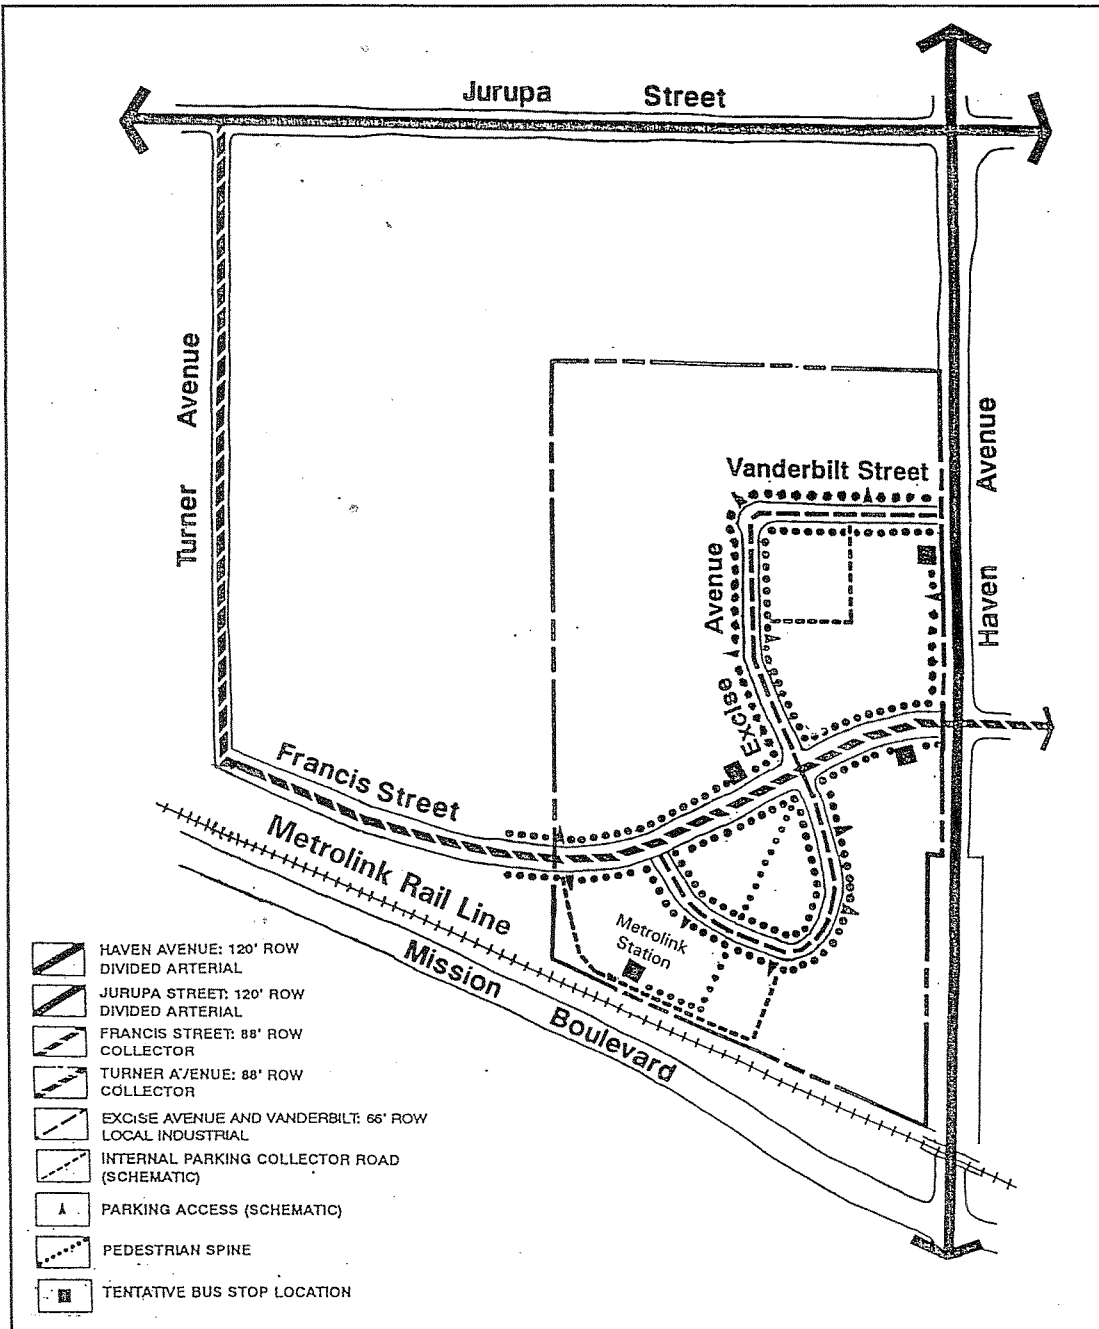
The Circulation Plan (note changes to plan, Preface, page iii)
